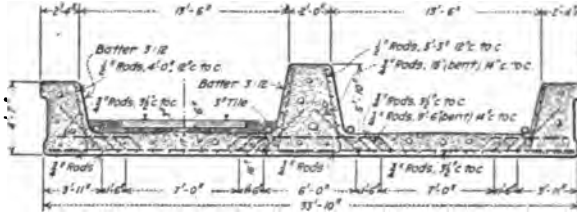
Cross-section of through-girder bridge, C. B. & Q. R. R.
